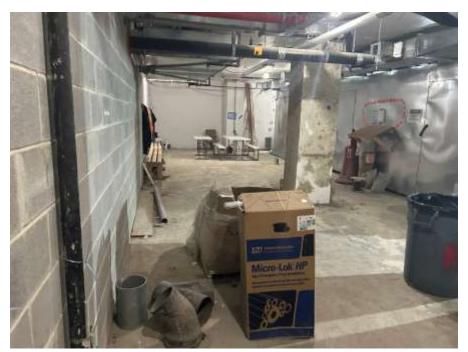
View of the eastern part of the site on the cellar floor, facing southeast.
